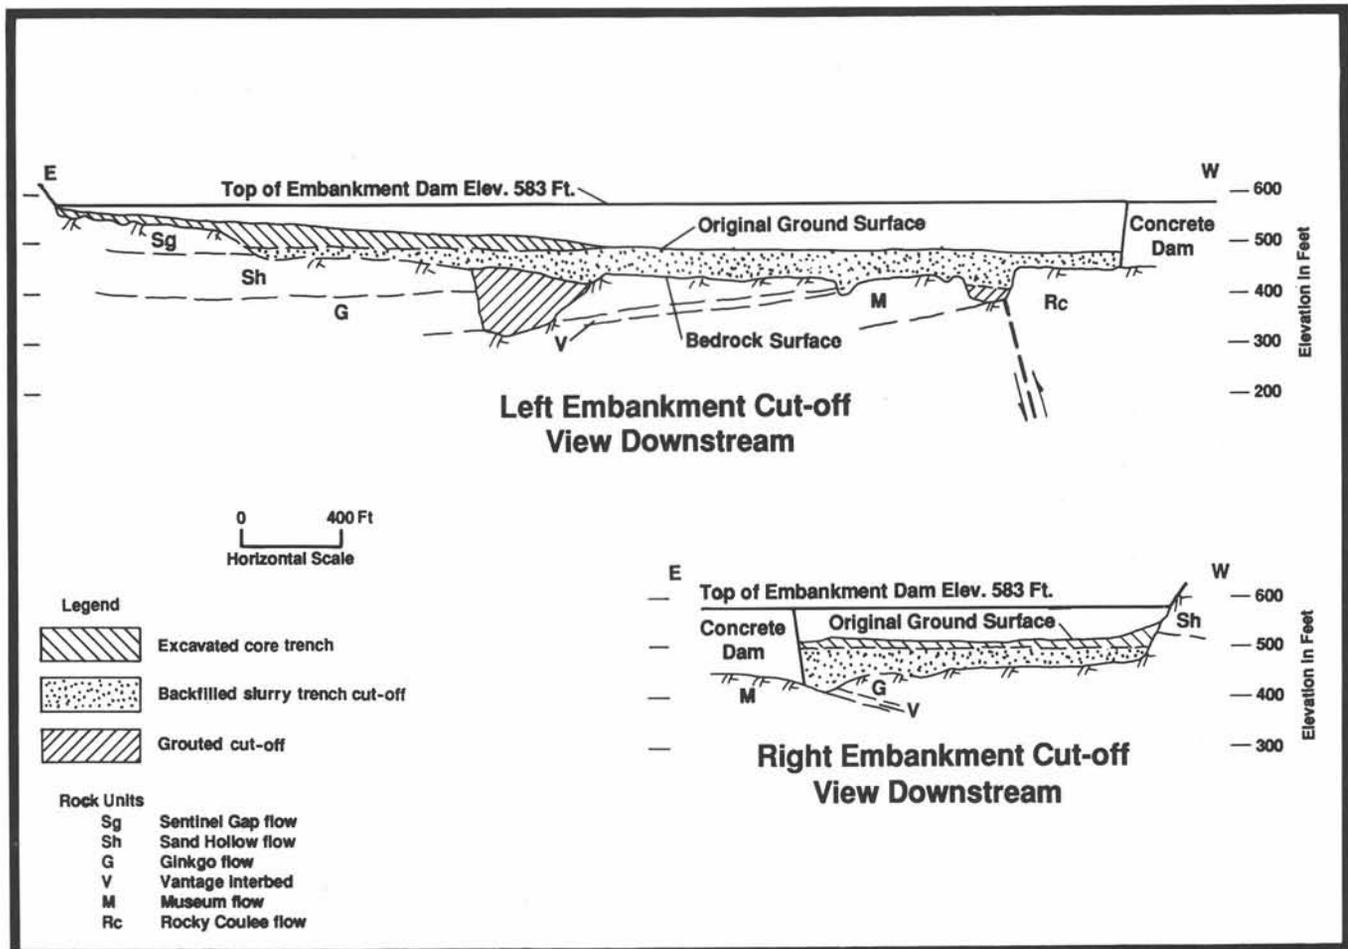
Wanapum Dam. Geologic sections along slurry cut-off trenches beneath the left and right embankments (after Harza Engineering Co., 1967b).
